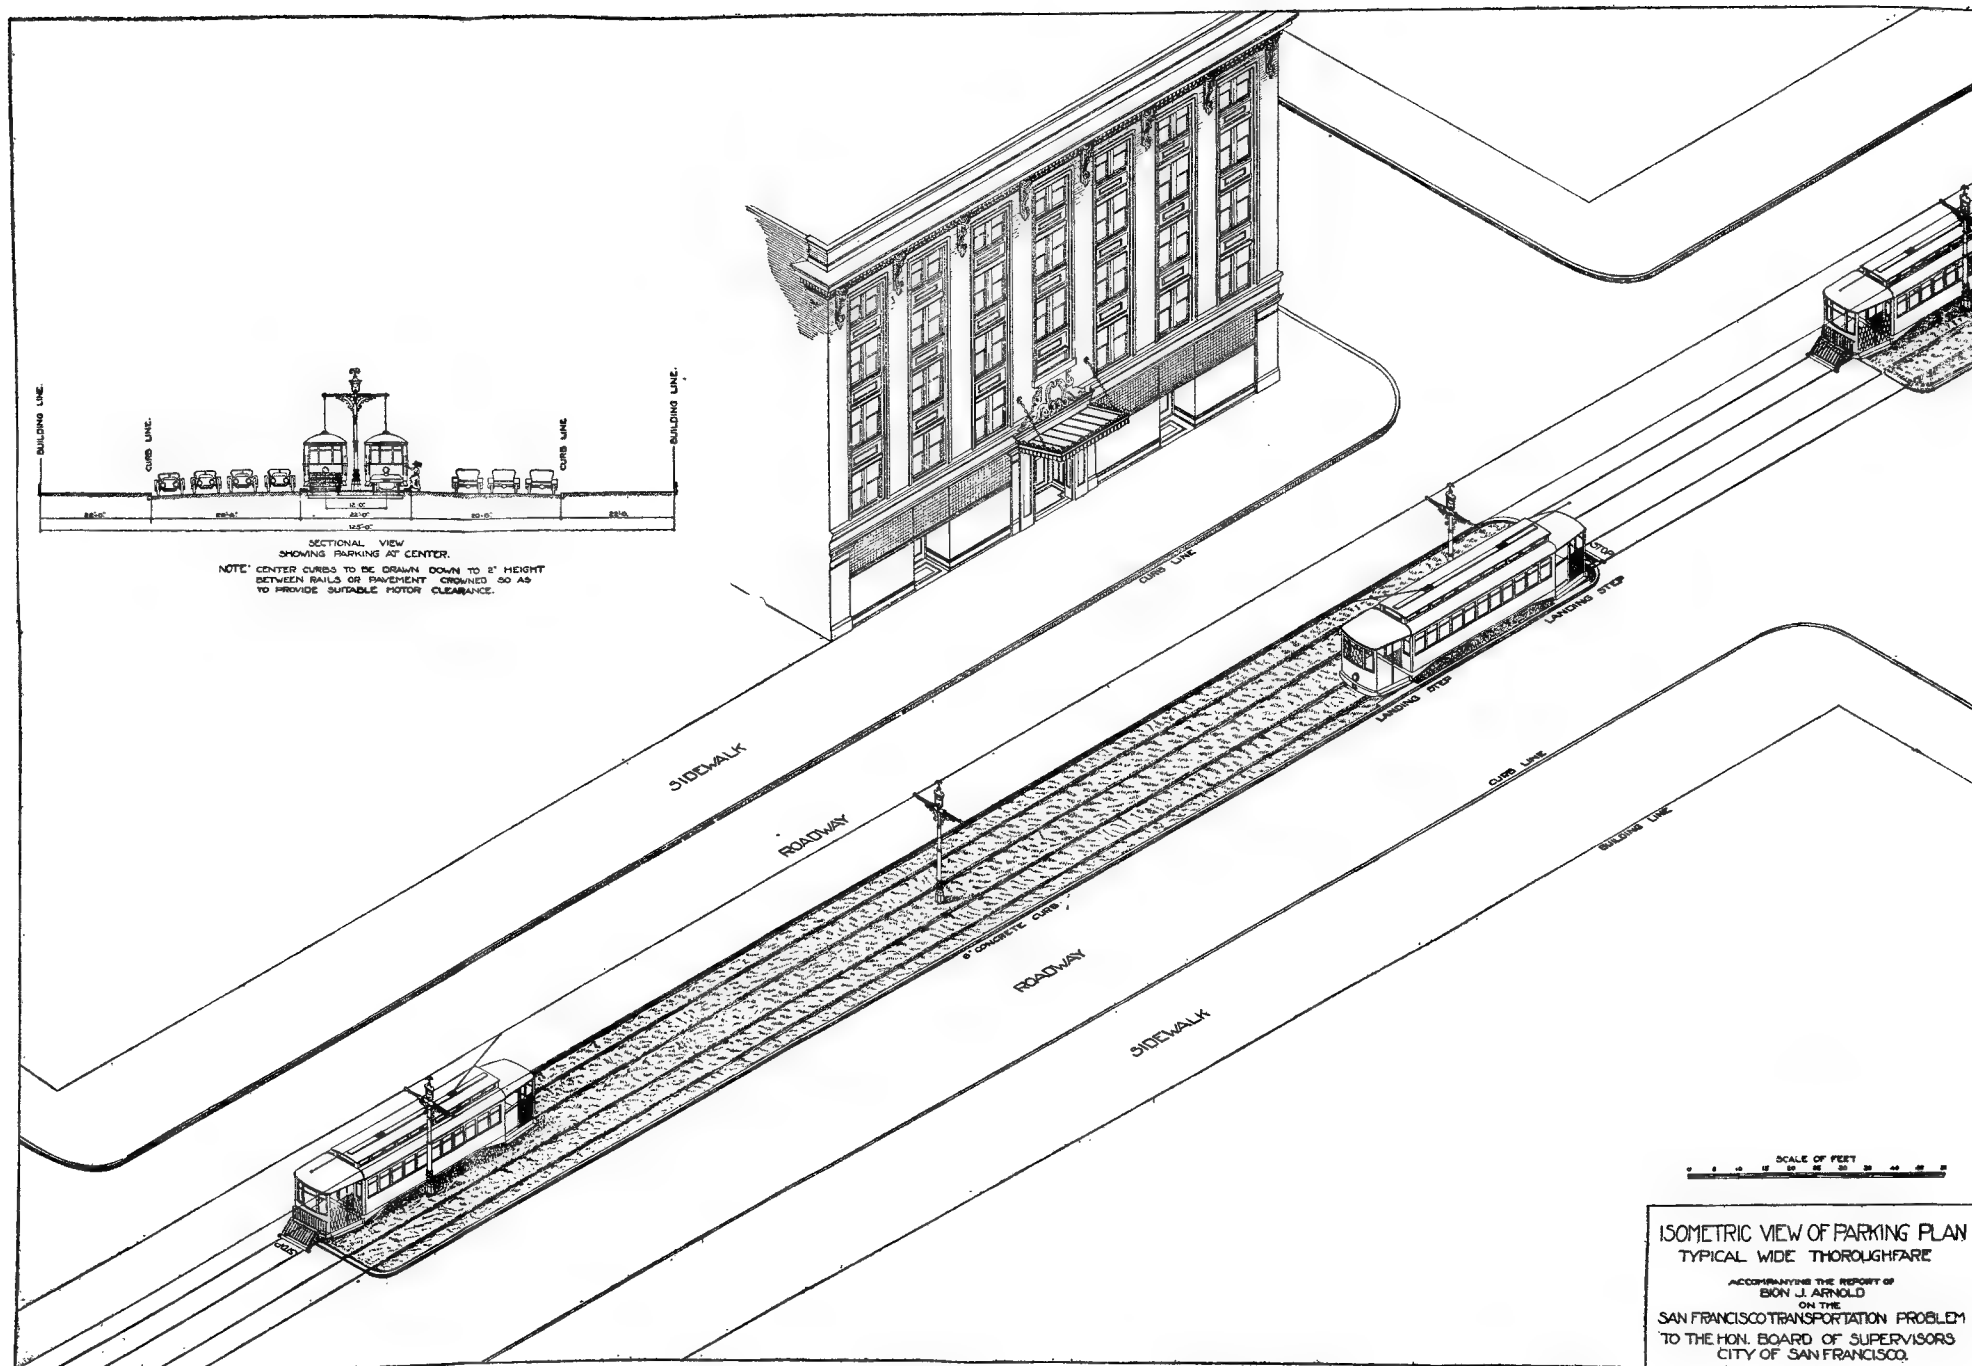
RAILWAY PARKING PLAN RECOMMENDED FOR WIDE THOROUGHFARE SUCH AS VAN NESS AVENUE.
